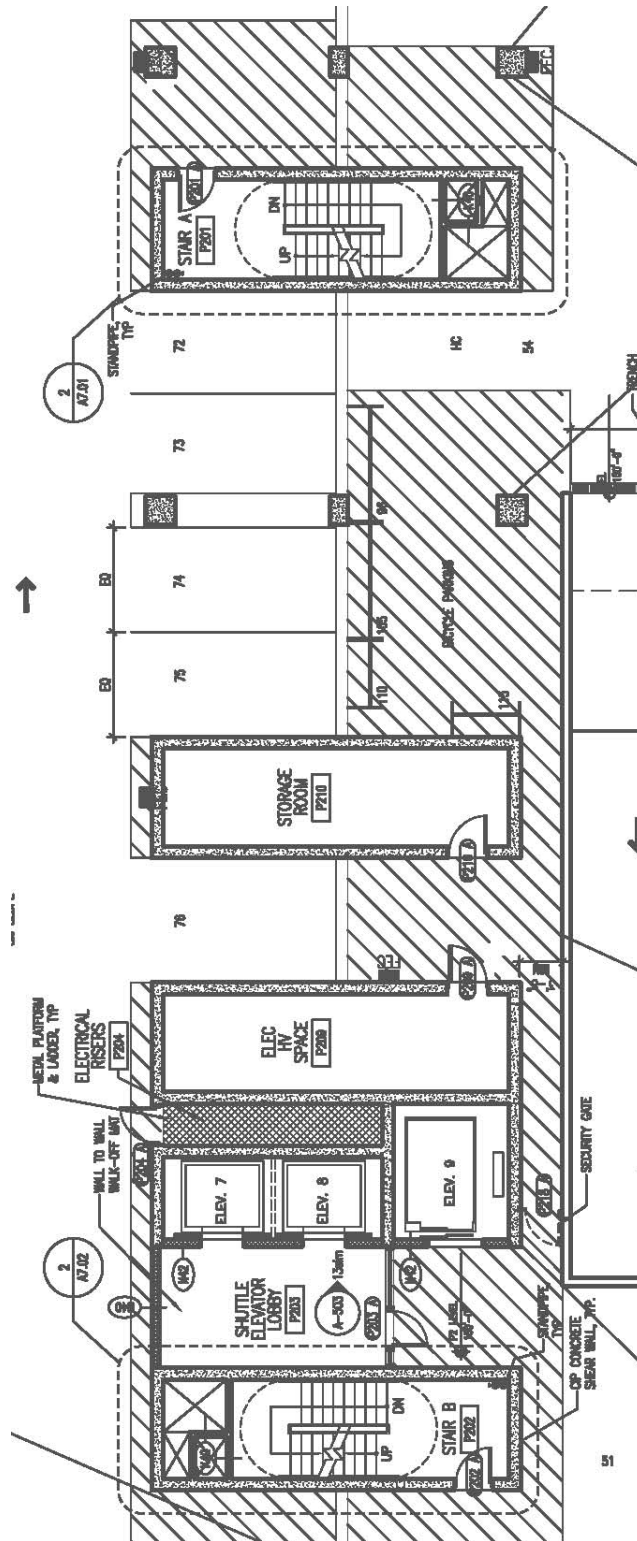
Original Parking Garage P2 Level Service Core Plan
